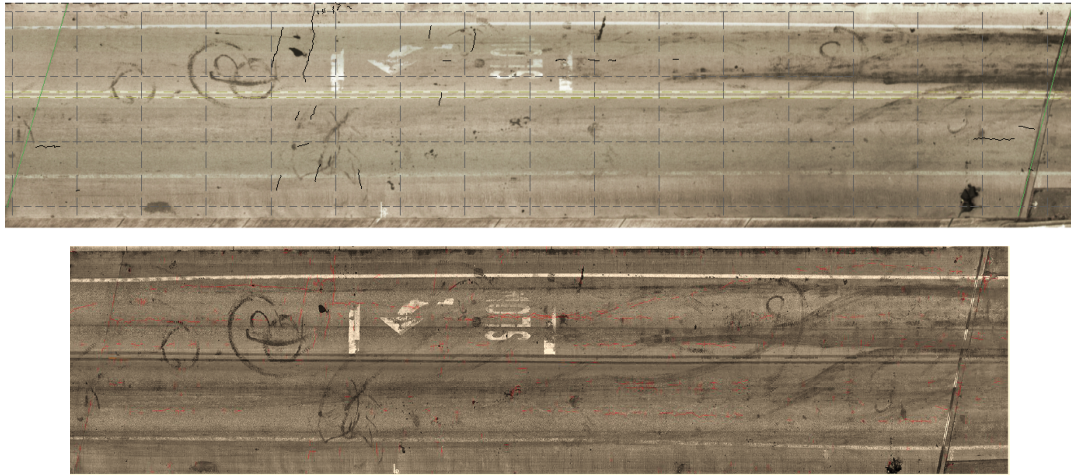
Existing Cracks of Bridge Deck No. 22266-Span 2
